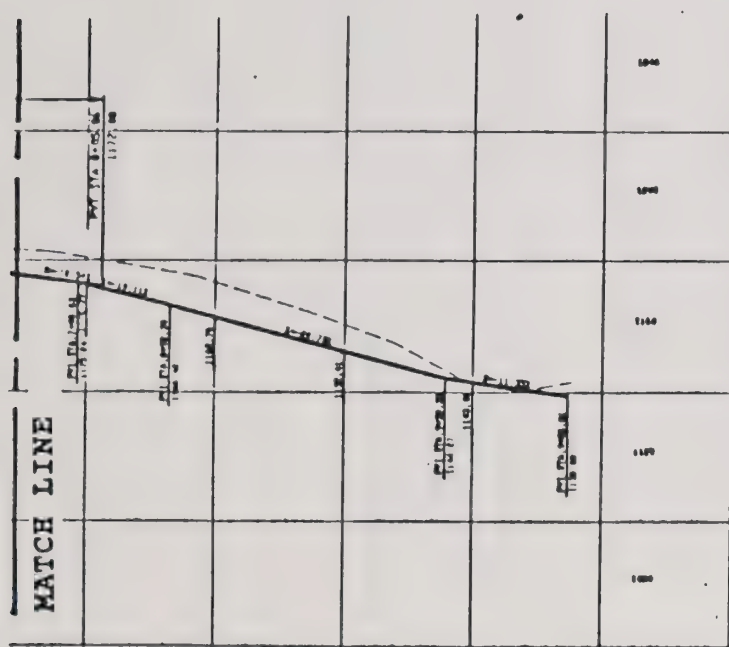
VILLAGE ROAD PROFILE
